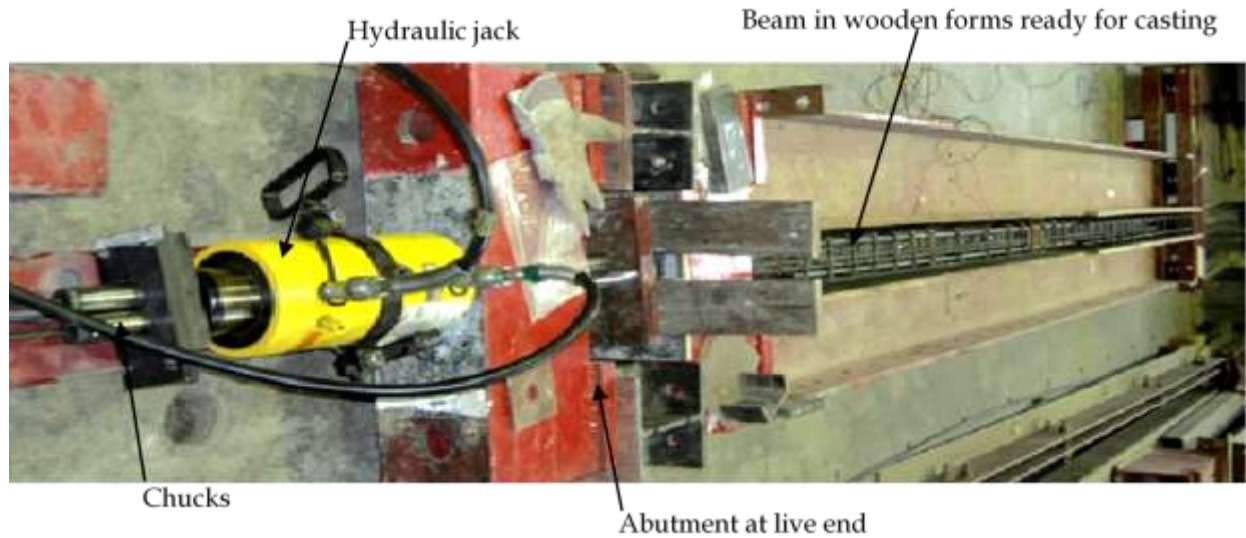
Prestressing bed with pre-tensioning setup and beam construction arrangement
